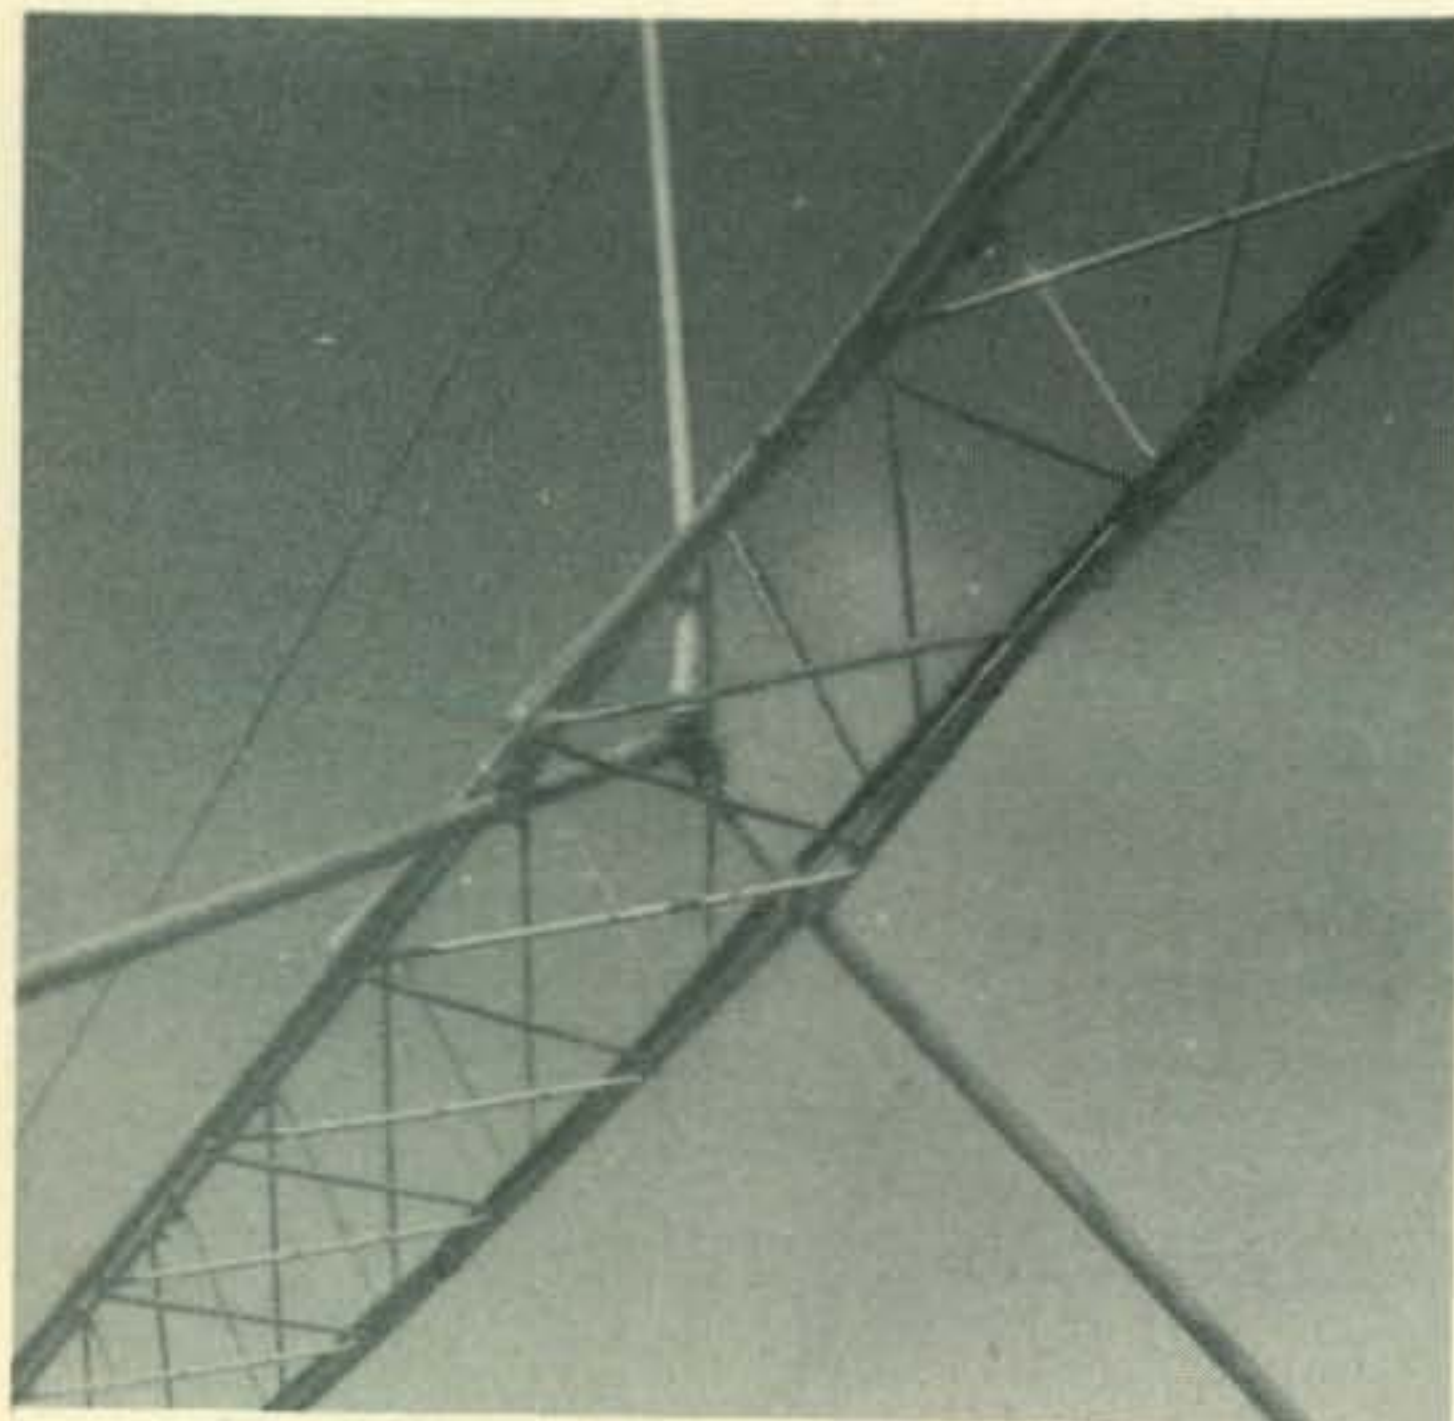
Close-up of strut installation showing slight "kick-bend" in one strut to align strut end with tower leg. Y-connector joins inner ends of struts.
